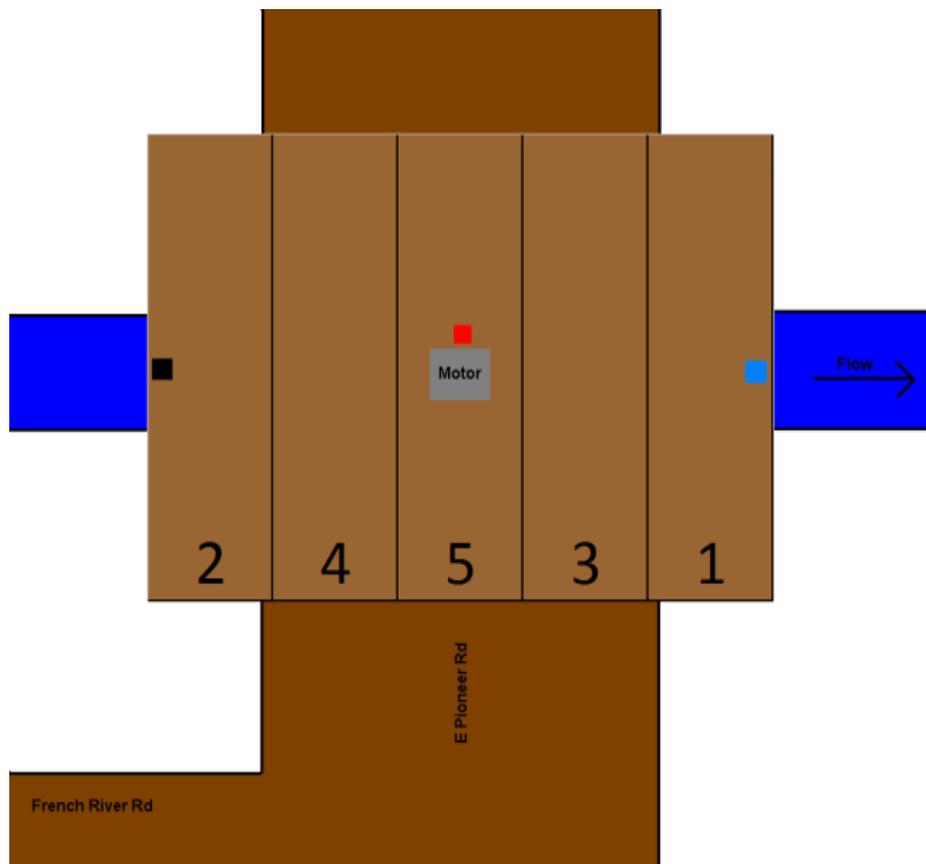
Final position of each section in the new Bridge 53 superstructure, as well as the final test setup. Sections 1-5 locations are identified.
